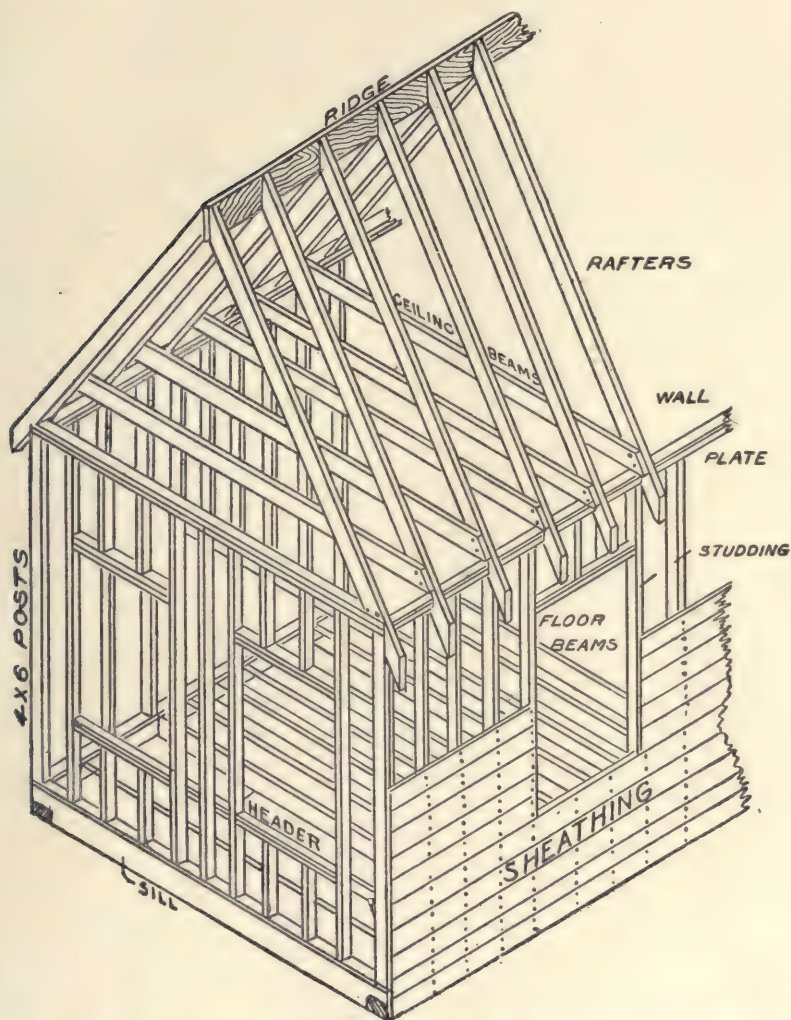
The Frame of a Small Framed Cottage, of One Story, with the Ceiling Beams and Rafters Raised, and one Side Partly Sheeted or Rough Boarded. Upper Headers are Doubled in the Windows.
